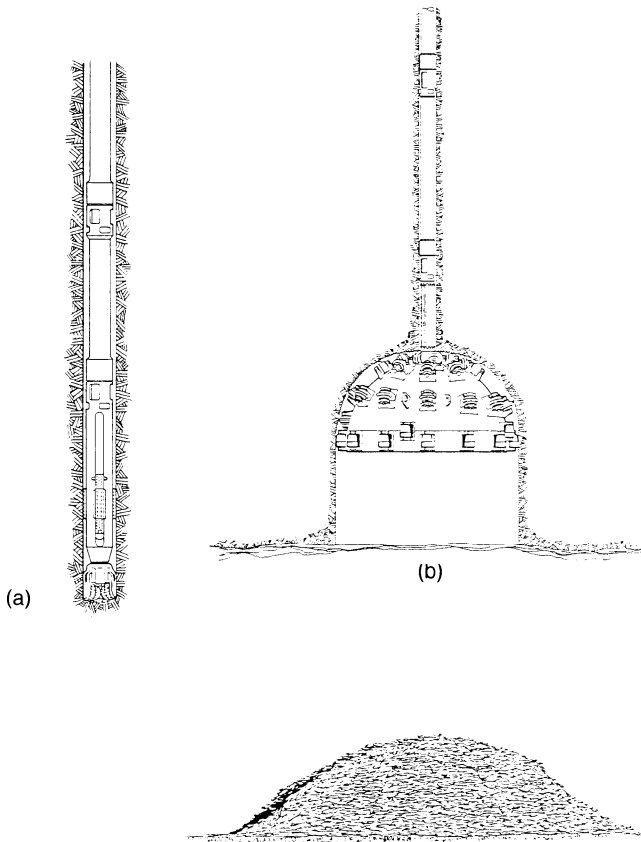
Pilot hole (a) drilling and (b) reaming (courtesy: Robbins Co.).
